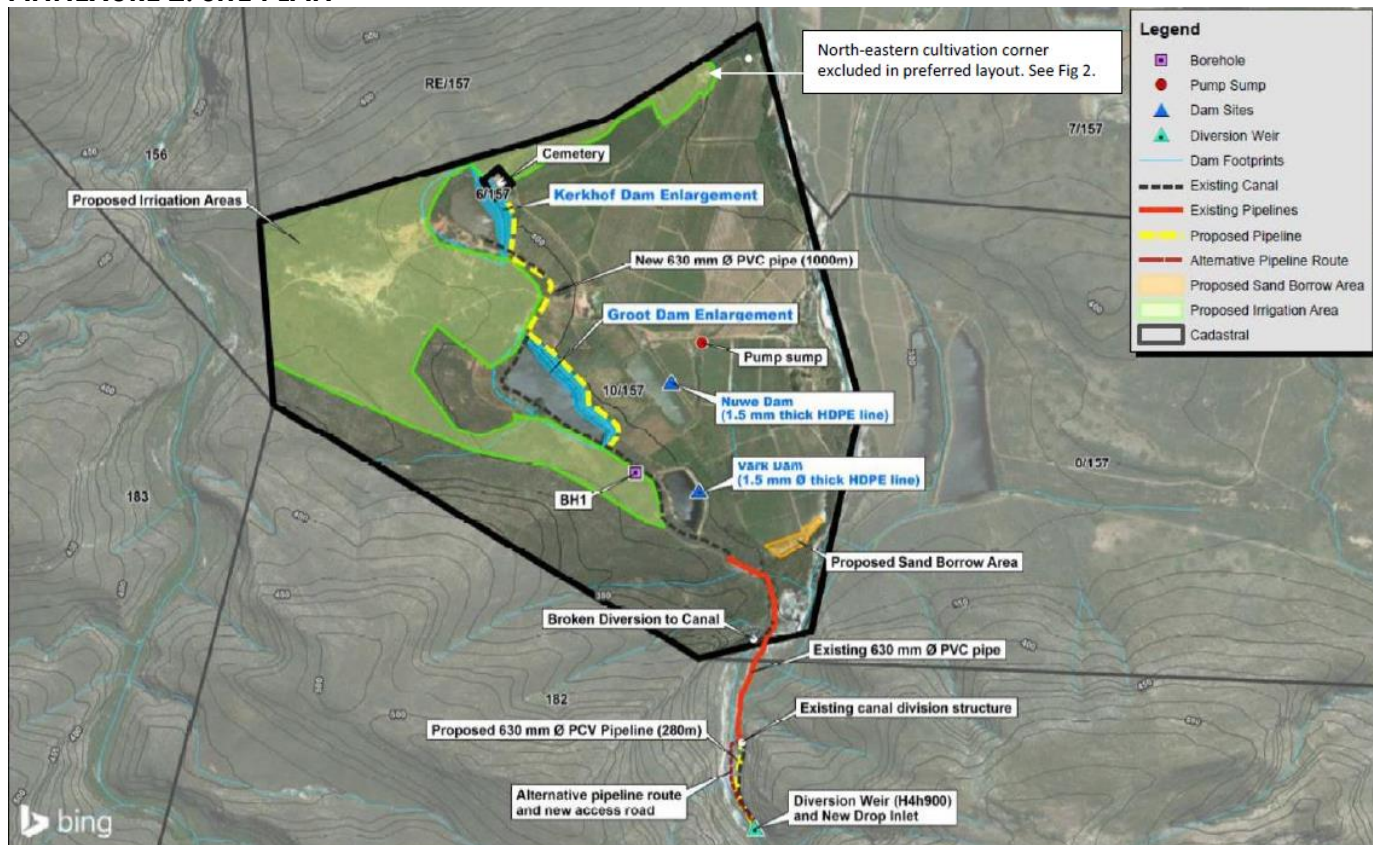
Site Plan depicting the proposed development on Portion 10 of the Farm Rheeboekskraal No. 157 and the Farm No. 182, Robertson.
